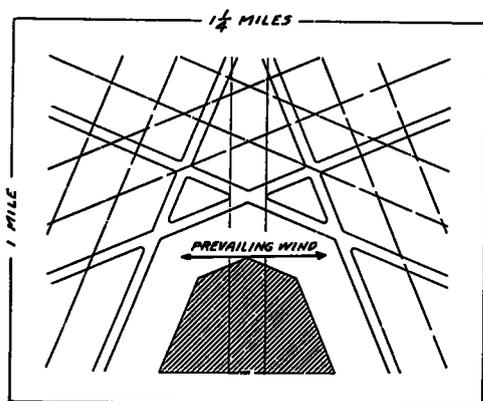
Triple Runway Scheme 8-Direction Layout 800 Acre Rectangle
